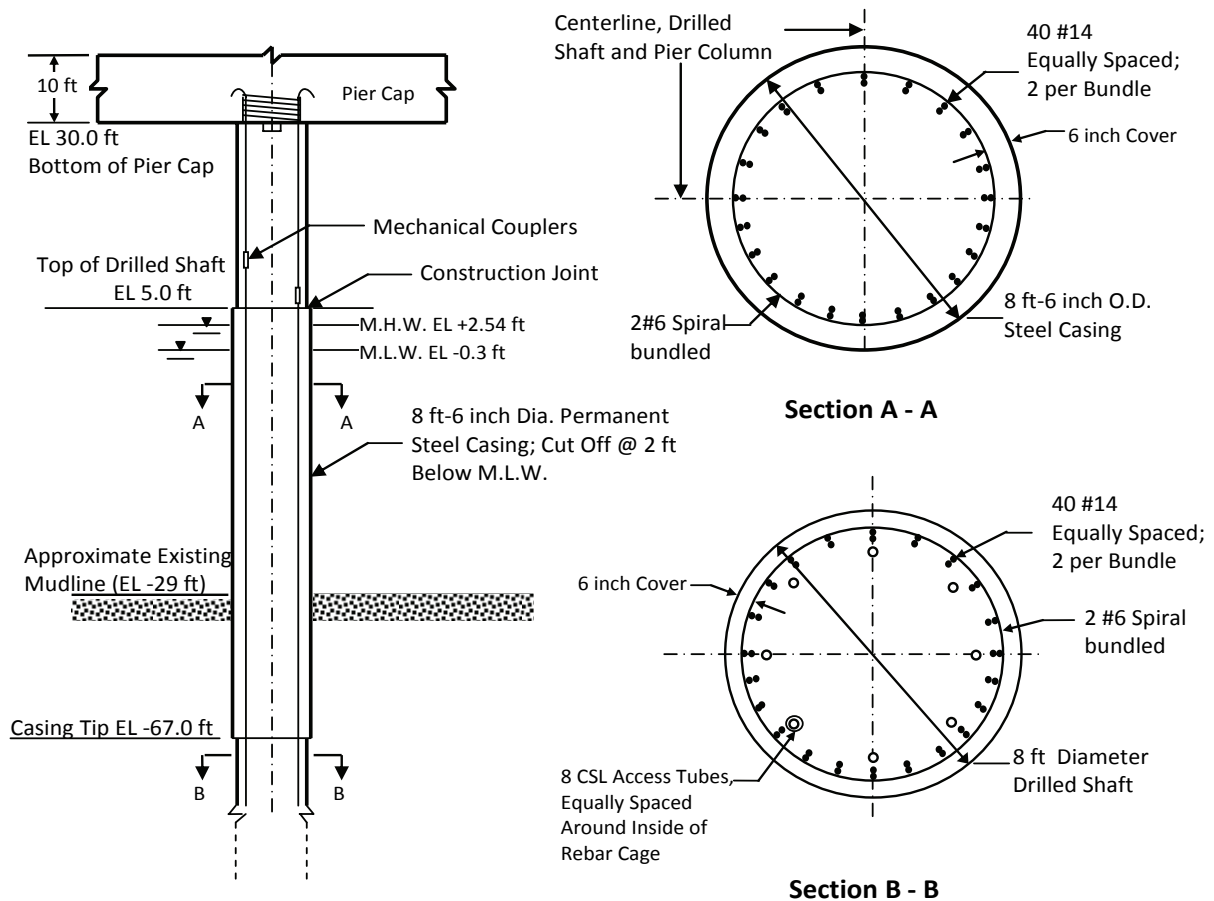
Elevation and Cross-Sections of Drilled Shafts at Pier 2.
